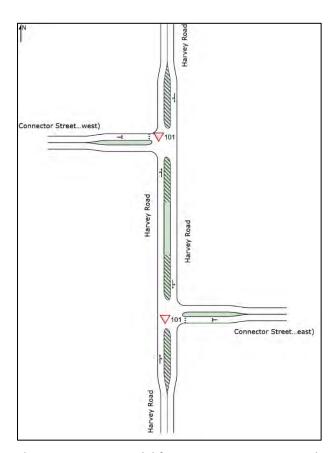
Harvey Road / future E-W connector road SIDRA intersection layout
